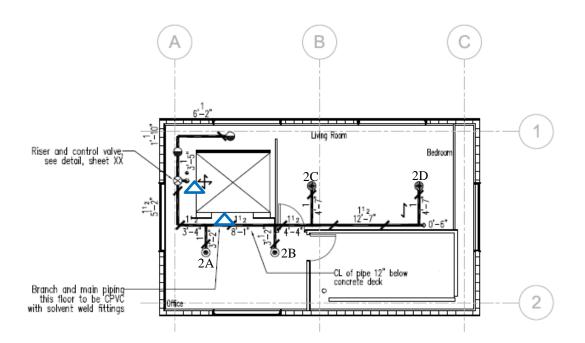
Floor 2 sprinkler system design layout and specifications
